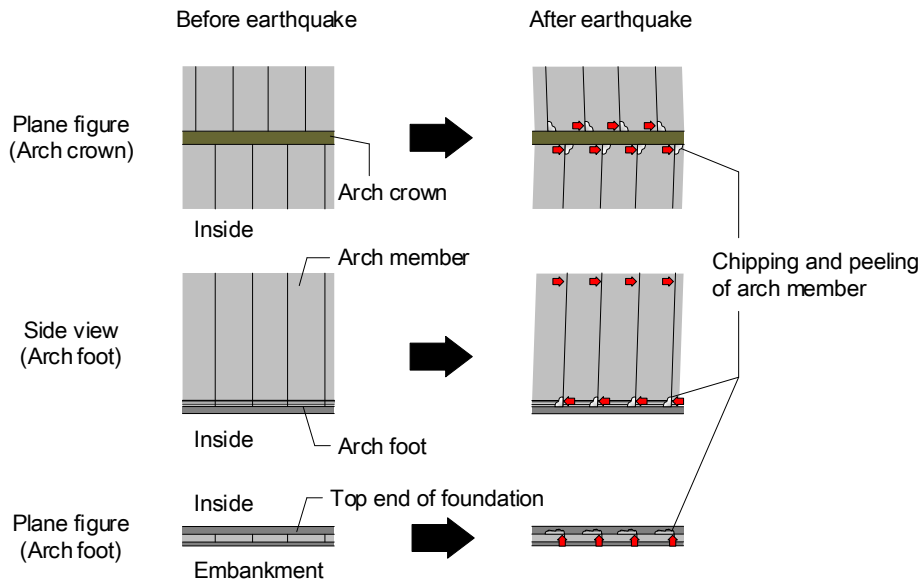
Damage mechanism of arch members due to Great East Japan Earthquake (assumed by Abe and Nakamura, 2014).
